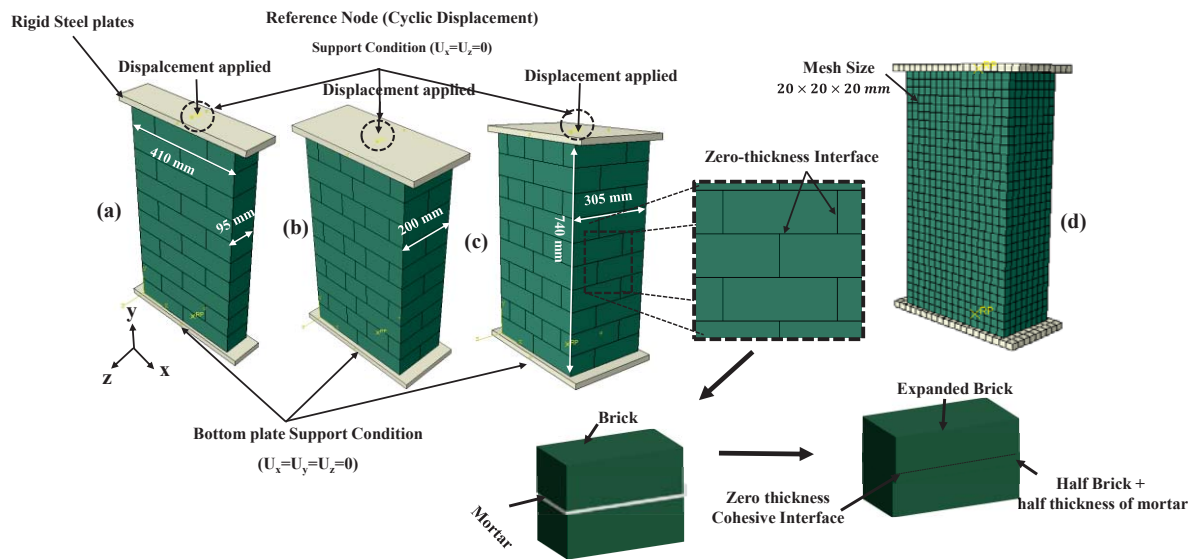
Wallettes model details (a) Single brick (b) Double brick (c) Triple brick with detail of expanded bricks and (d) Mesh size
